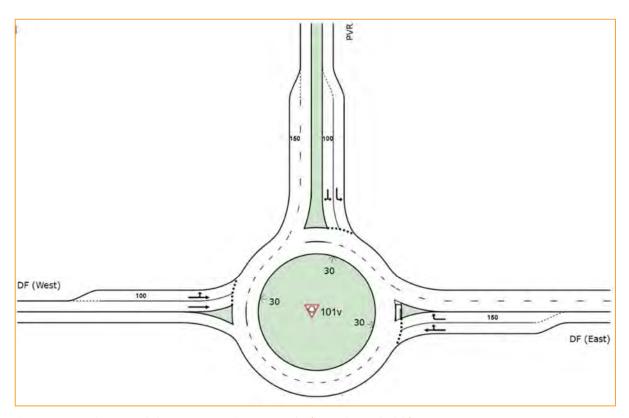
Interim Roundabout Intersection Upgrade (2,800 households)
